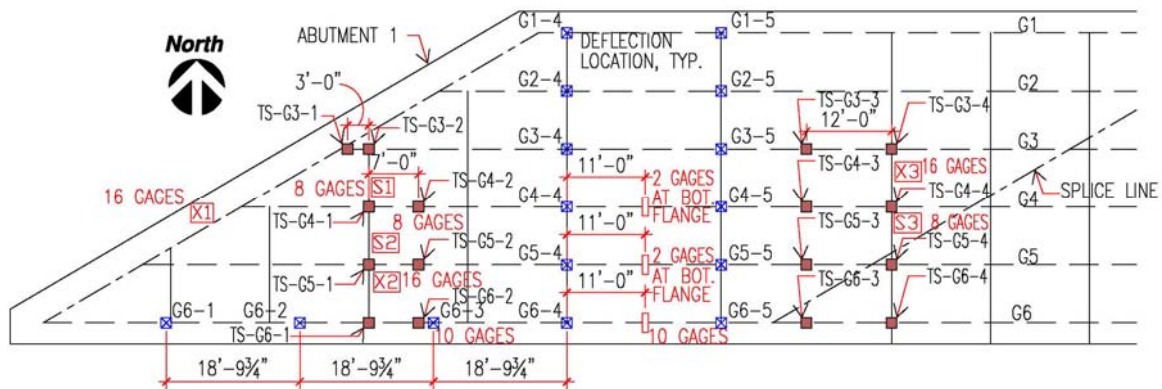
Instrumentation Plan for 19th Street Bridge over US 82
